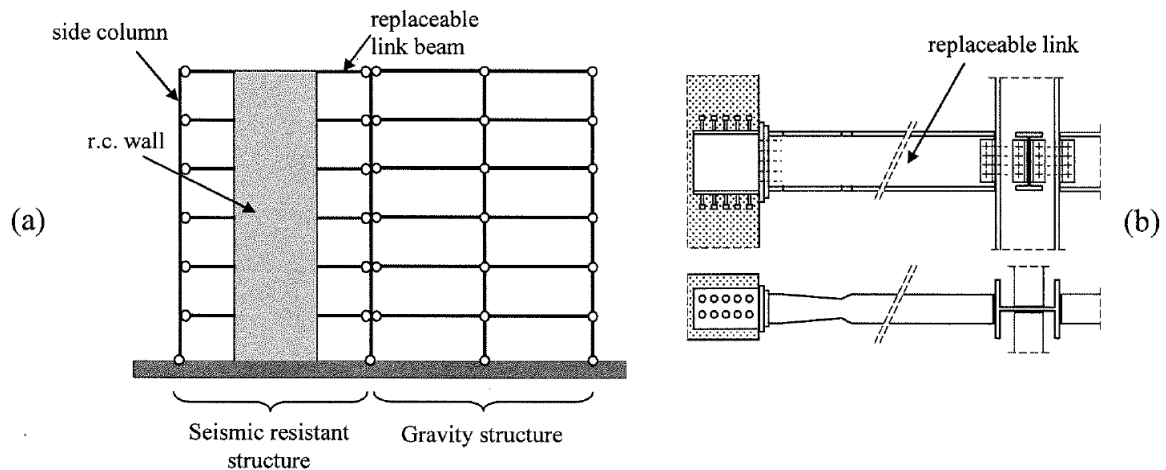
(a) Scheme of the proposed innovative system connected to a gravity-resisting steel frame with pinned beam-to-column joints, (b) example of replaceable steel link.
